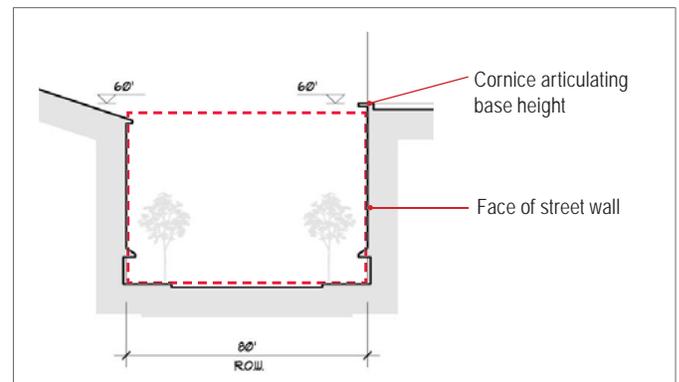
Street section with 3:4 proportions, with cornice articulation defining building base height.
